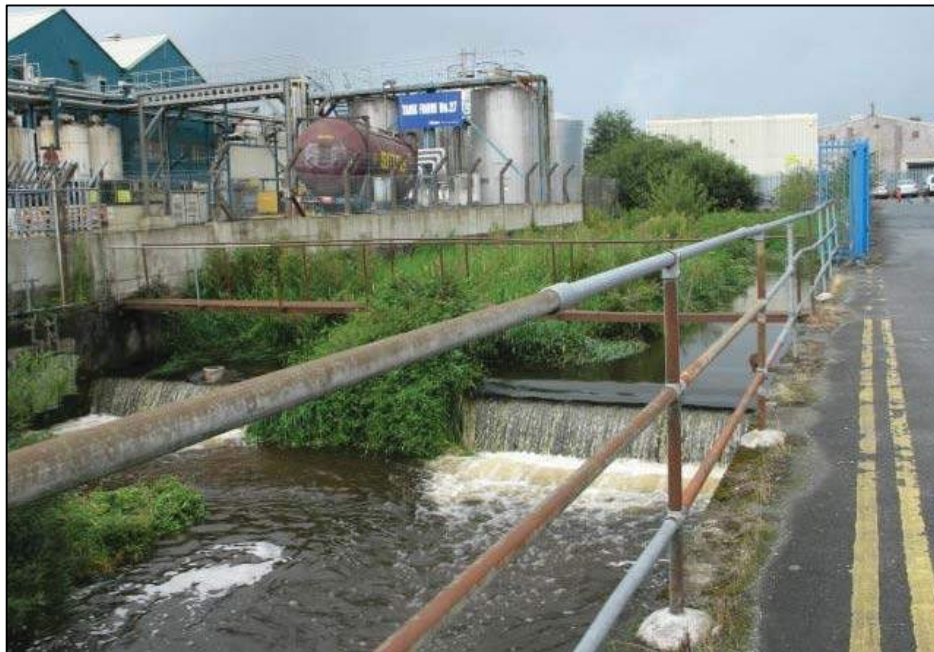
River Bride sluice at south end of Dulux Factory (in area of proposed sediment trap)
